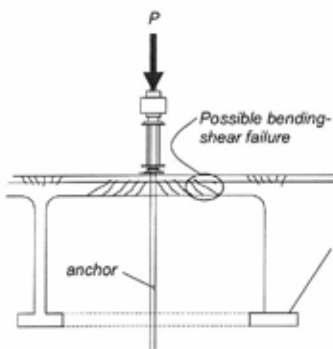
Proposed loading arrangement with a jack supported by anchors injected into the rock (some 10 m below the bridge foundation slabs). A possible combined bending-shear failure close to the load point is indicated.
